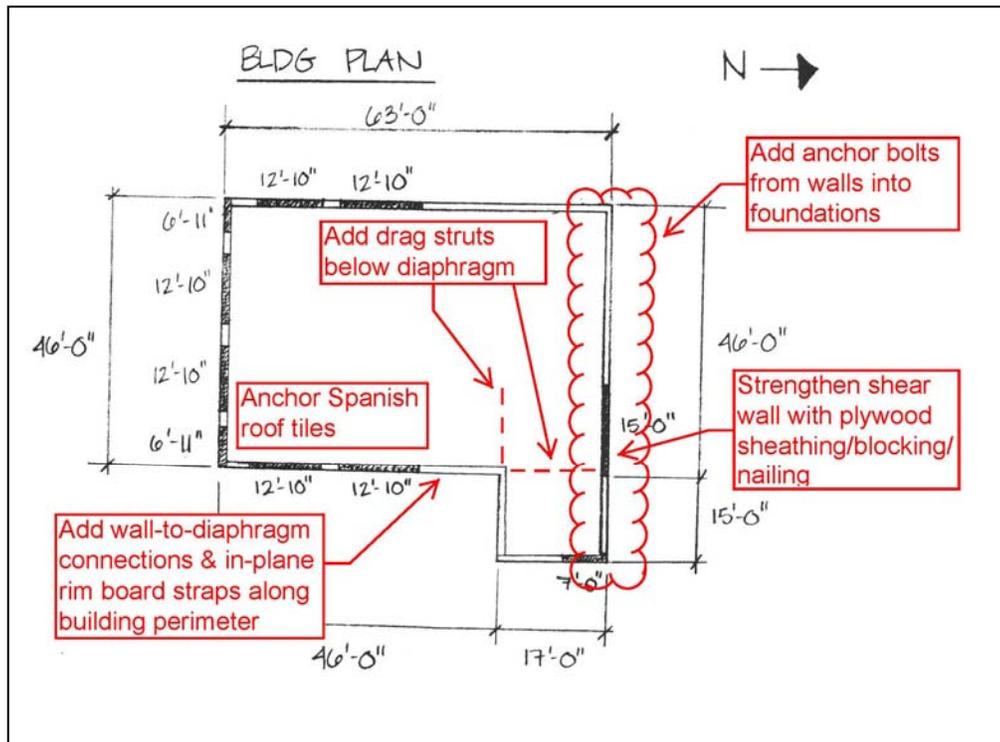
1981 Building Addition Plan Summary of Recommendations
